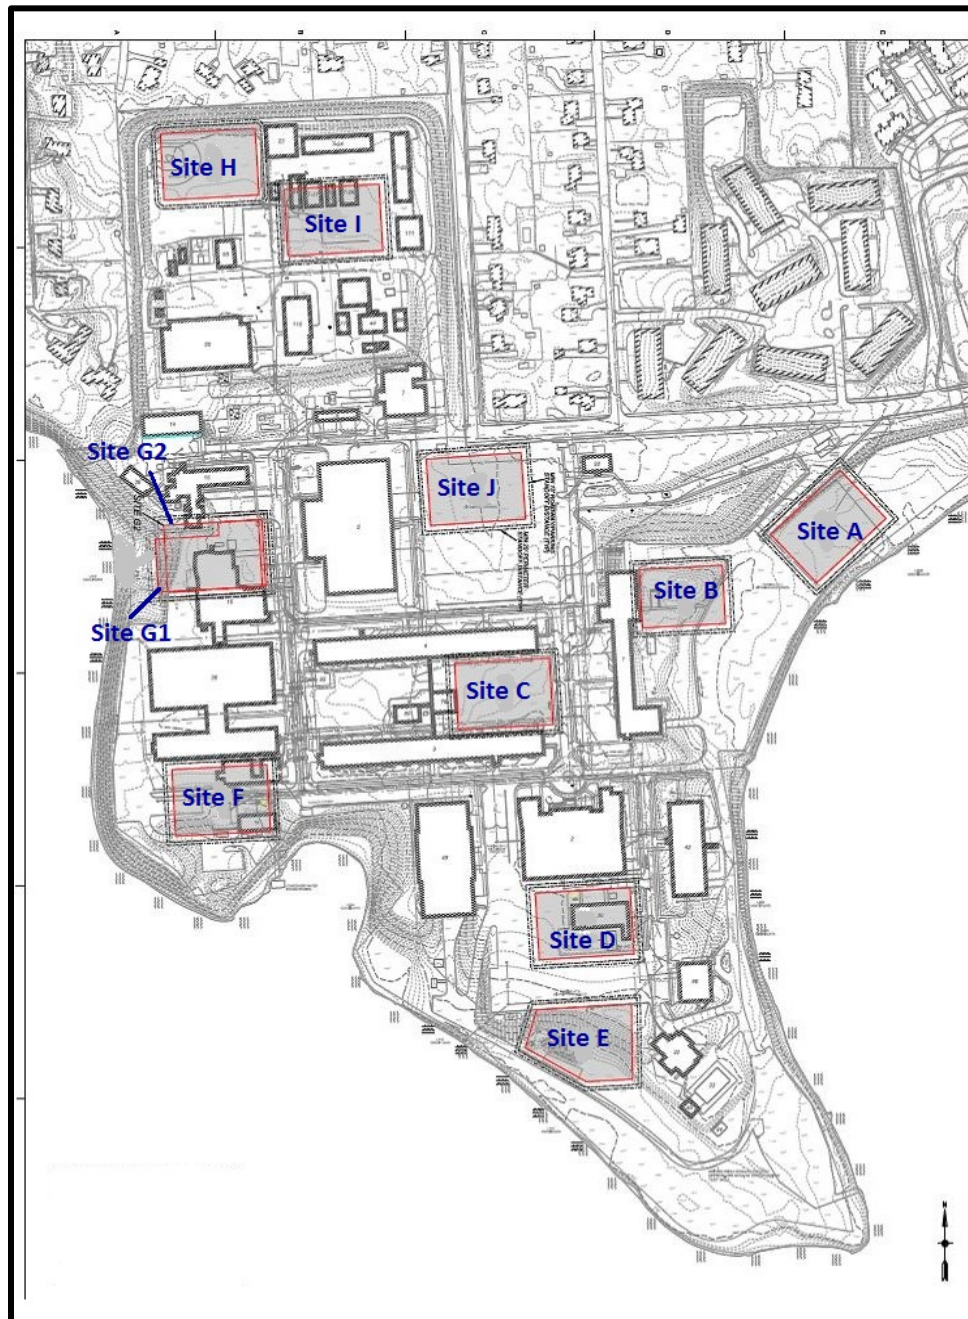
Alternatives for Building Site Location on the NSSC Facility
